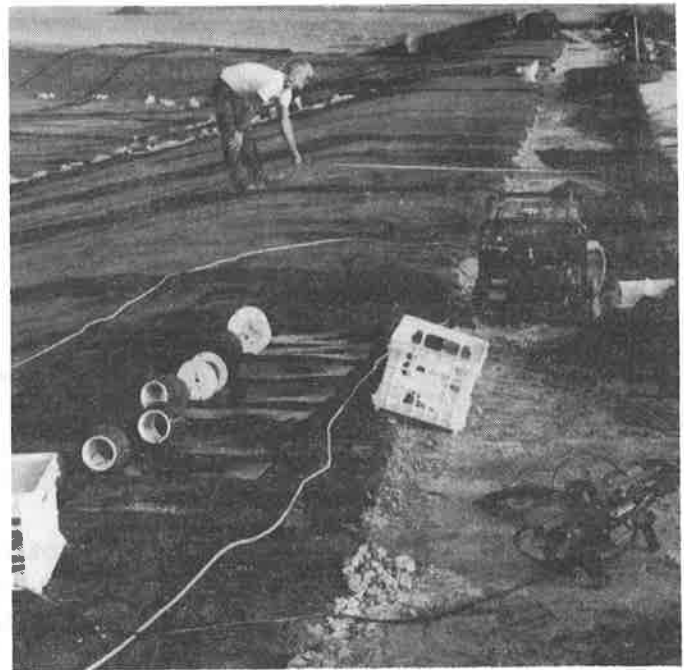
(b) shows some detail of the installation of the thermocouple leads. The leads were laid above the geomembrane and under the geotextile protection layer. Note that leads were not placed within a pipe. It has been suggested by Richardson and Bove (1987) that this practice may lead to a source of error in that changes in resistance of the gages and the leads running back to the data acquisition system may be affected by moisture within a pipe. The presence of vapor diffusing through the coating of the thermocouple leads could change the resistance in the line a few micro-ohms. This process would mimic temperature fluctuations and circumvent proper data collection. The Teflon® and Neoflon® coating of the leads used in this study are heavy duty and in their unprotected state would be no more susceptible to diffusion than if they were placed inside a standard commercially available pipe. In addition, pipes on uneven subgrades tend to bend, compress and even break, all of which could damage the leads and render the thermocouples ineffective.
